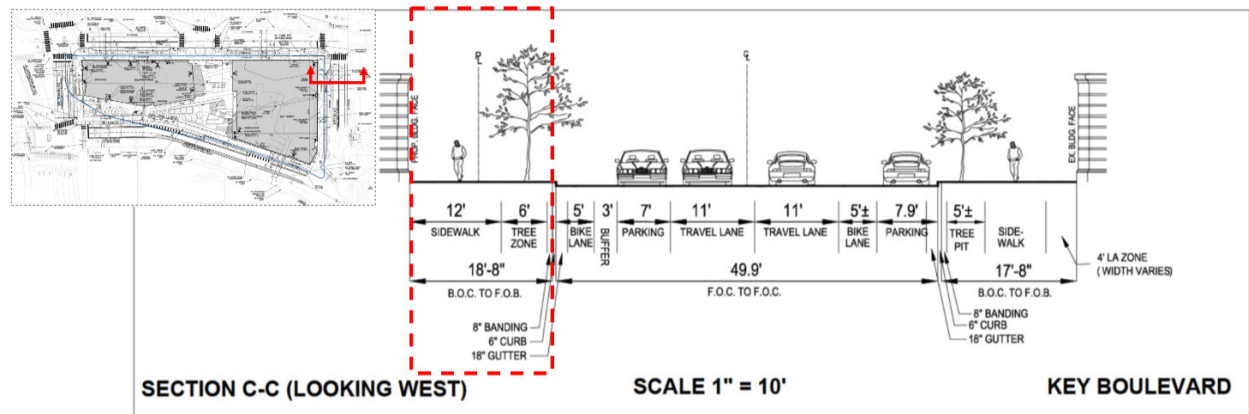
Proposed Key Boulevard (Western Portion) Cross-section.
